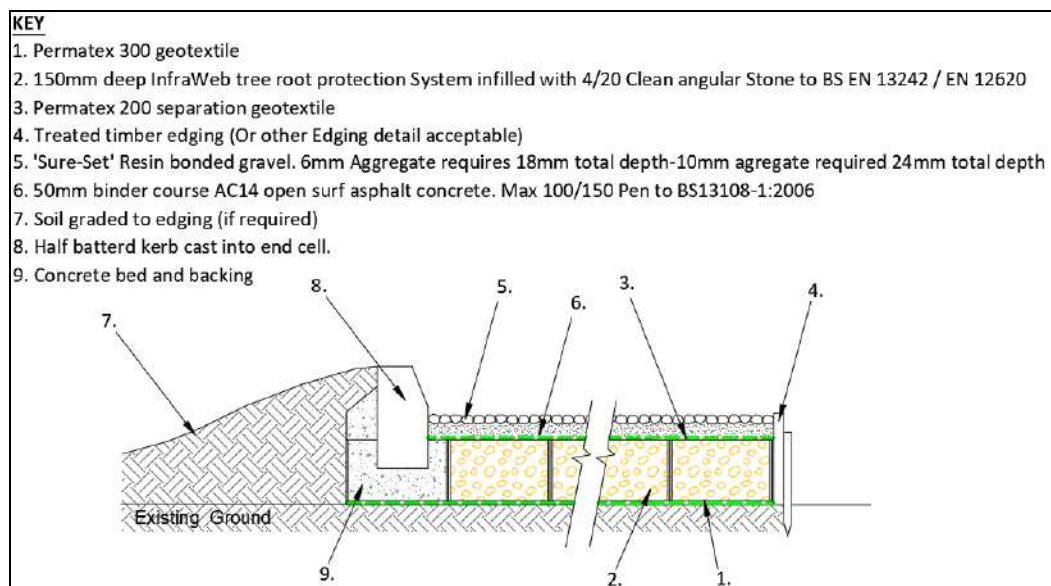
Example cross section of no dig road section with porous resin bonded gravel surface dressing
